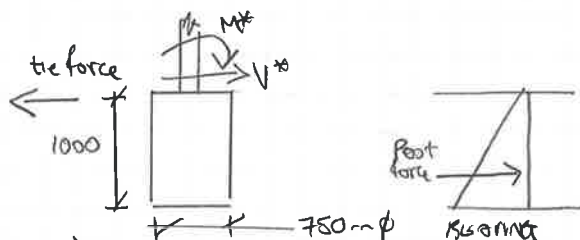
Portal frame details → 100mm ϕ Posthole
